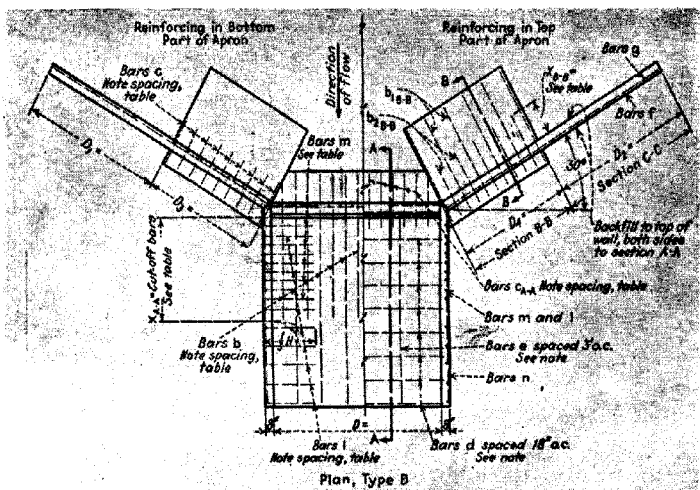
REINFORCED CONCRETE WEIR NOTCH DAM
